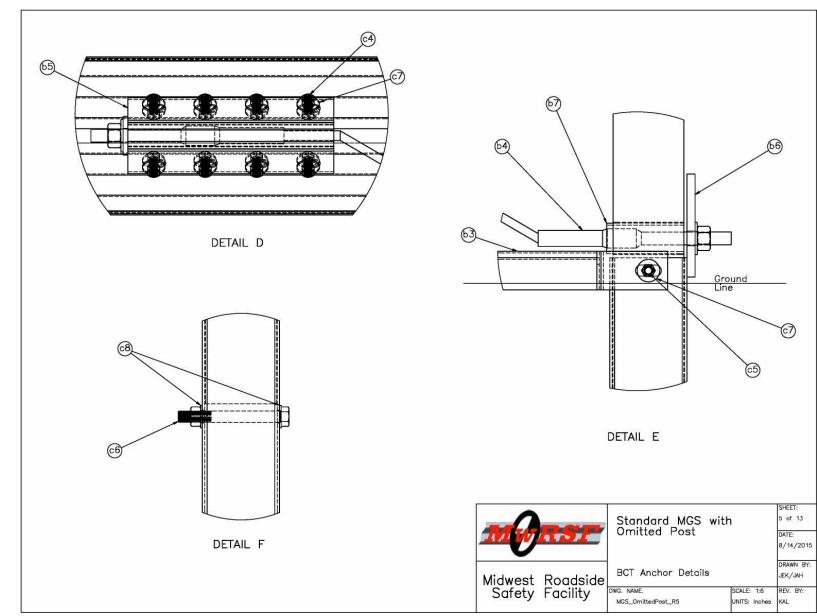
Anchorage Component Details, Test No. MGSMP-1
